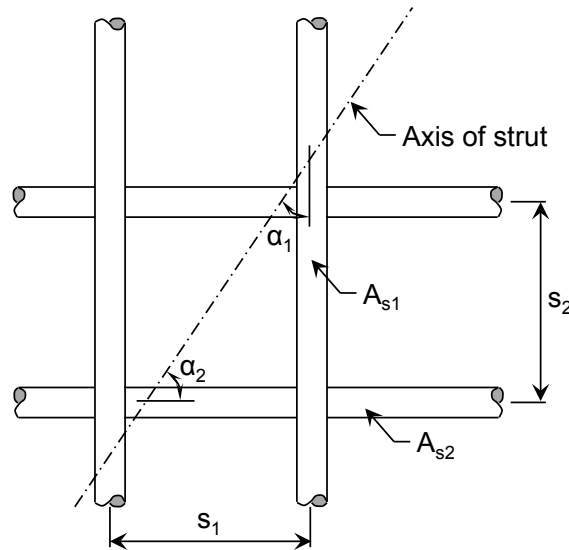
Reinforcement crossing a strut (taken from ACI 318-08).
